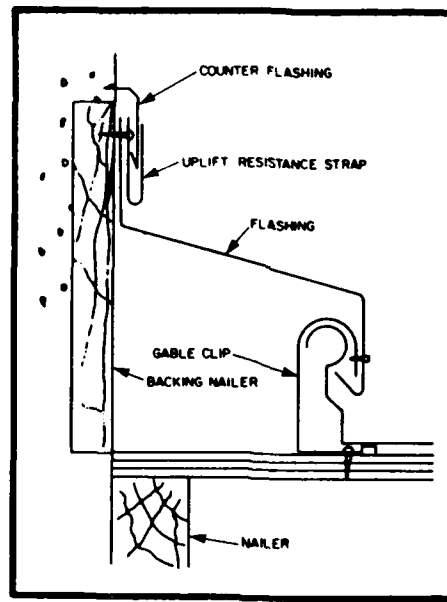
Metal flashing with slipjoint at sidewall—example 3.
